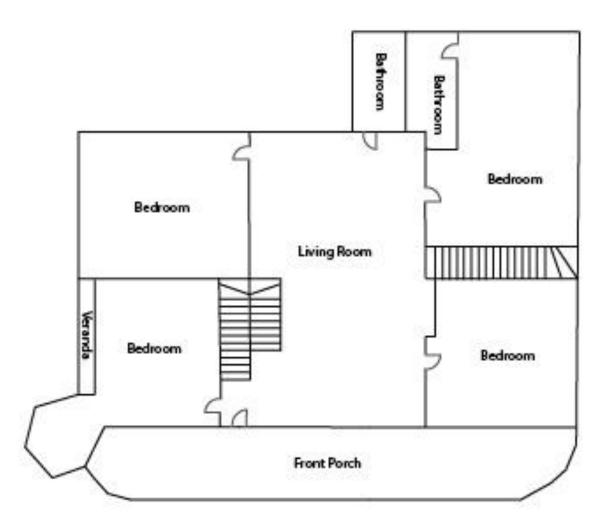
Rough plan of the second floor of the Bracht House. Not to scale. Source: HHM & Associates, Inc., 2022.
